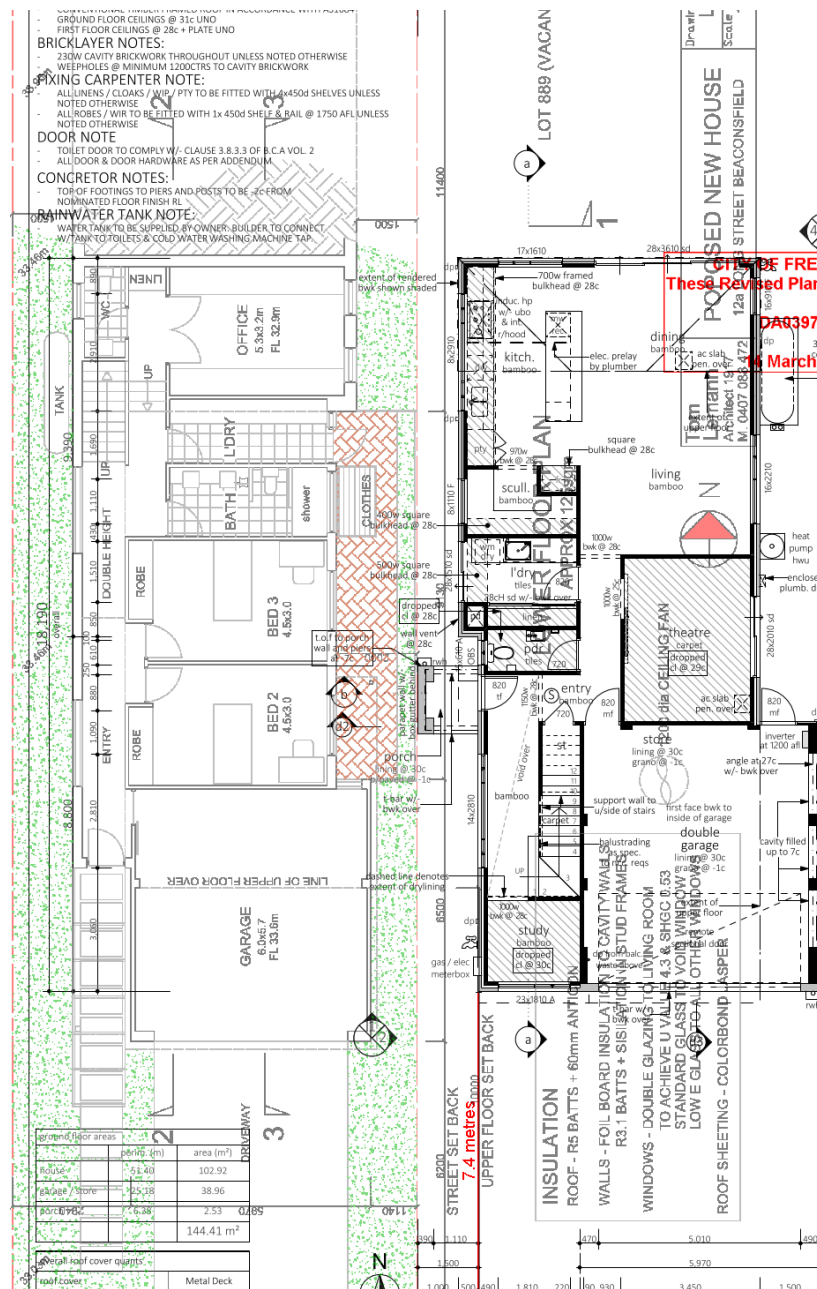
Ground floor comparison of existing adjoining dwelling (12A Long Street) on left and proposed dwelling at 12B Long Street (right).
